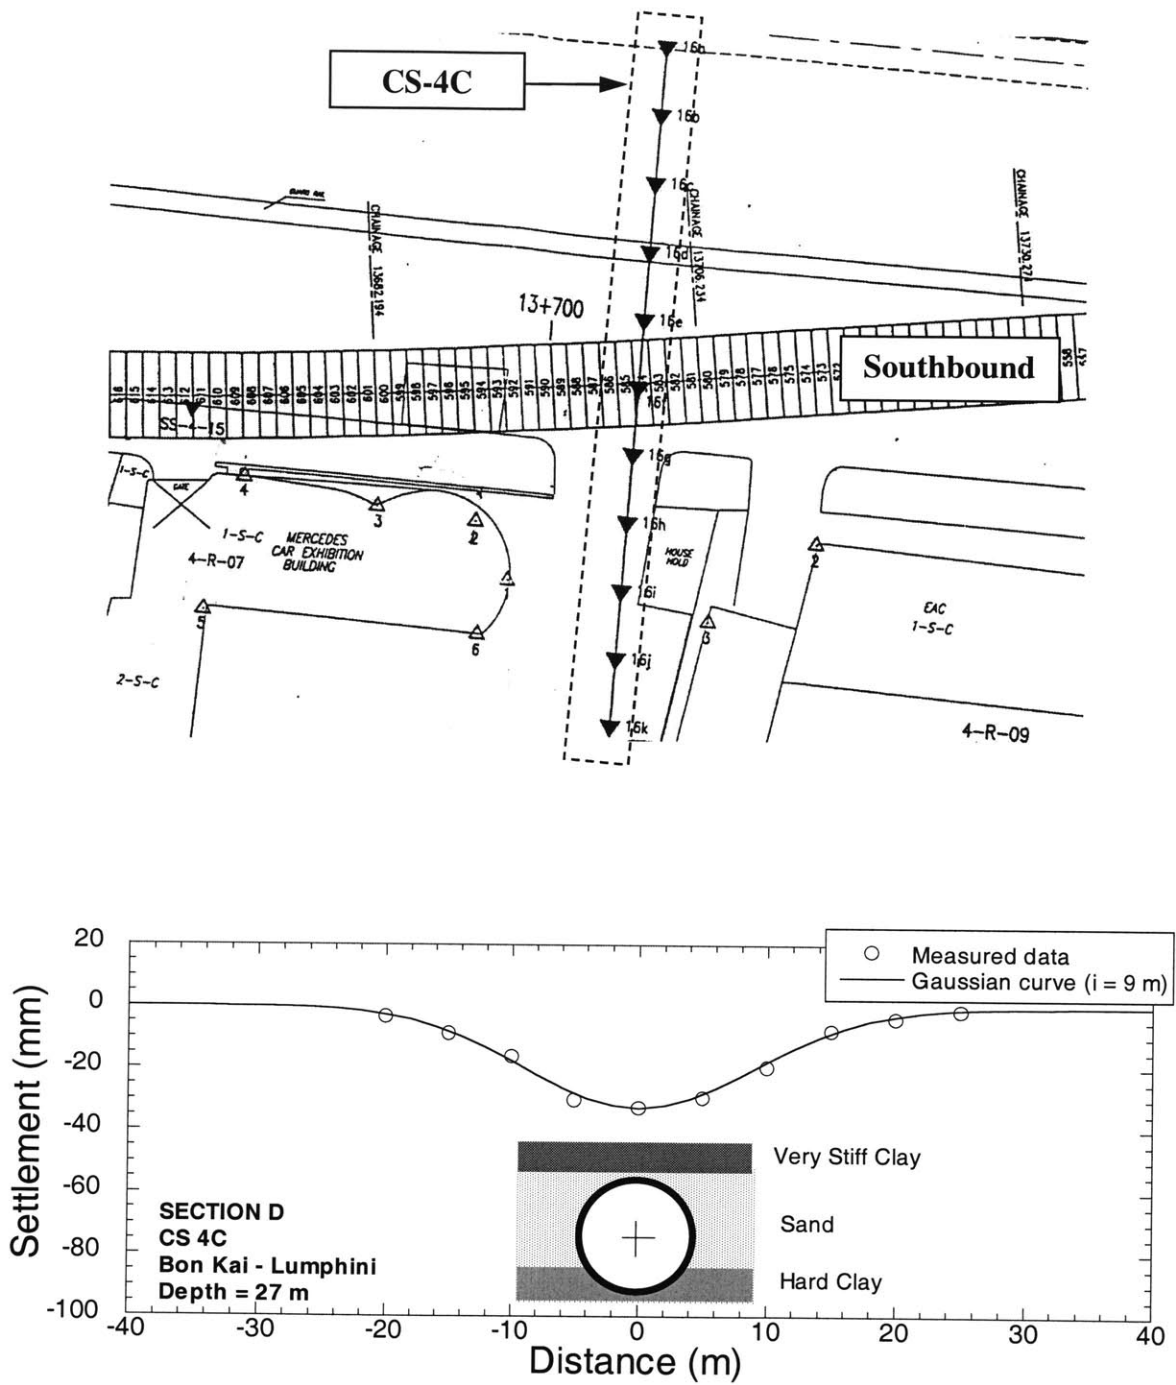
Surface settlement trough measured on CS-4C (southbound tunnel-Ring no.584) and the instrumentation layout
